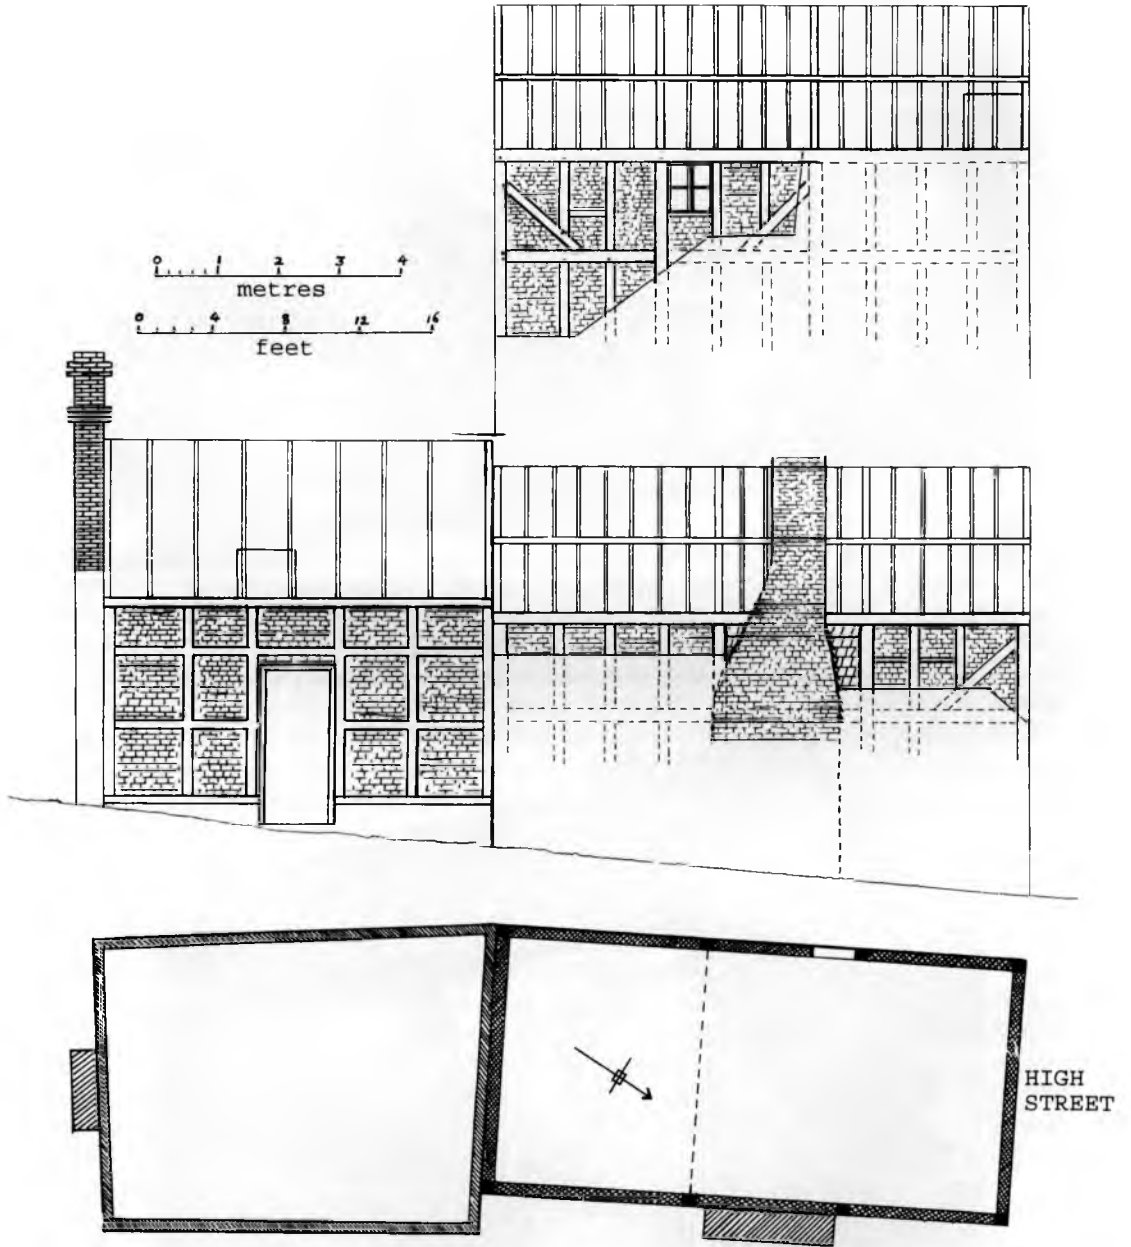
ATTEMPTED RECONSTRUCTION OF THE BUILDING ON THE SITE OF 24 HIGH STREET.
